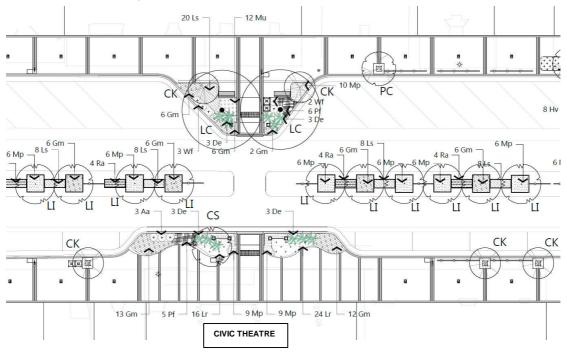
Detail Plan of the Civic Theatre Canopy & proposed trees. (MARA Consulting P/L)
